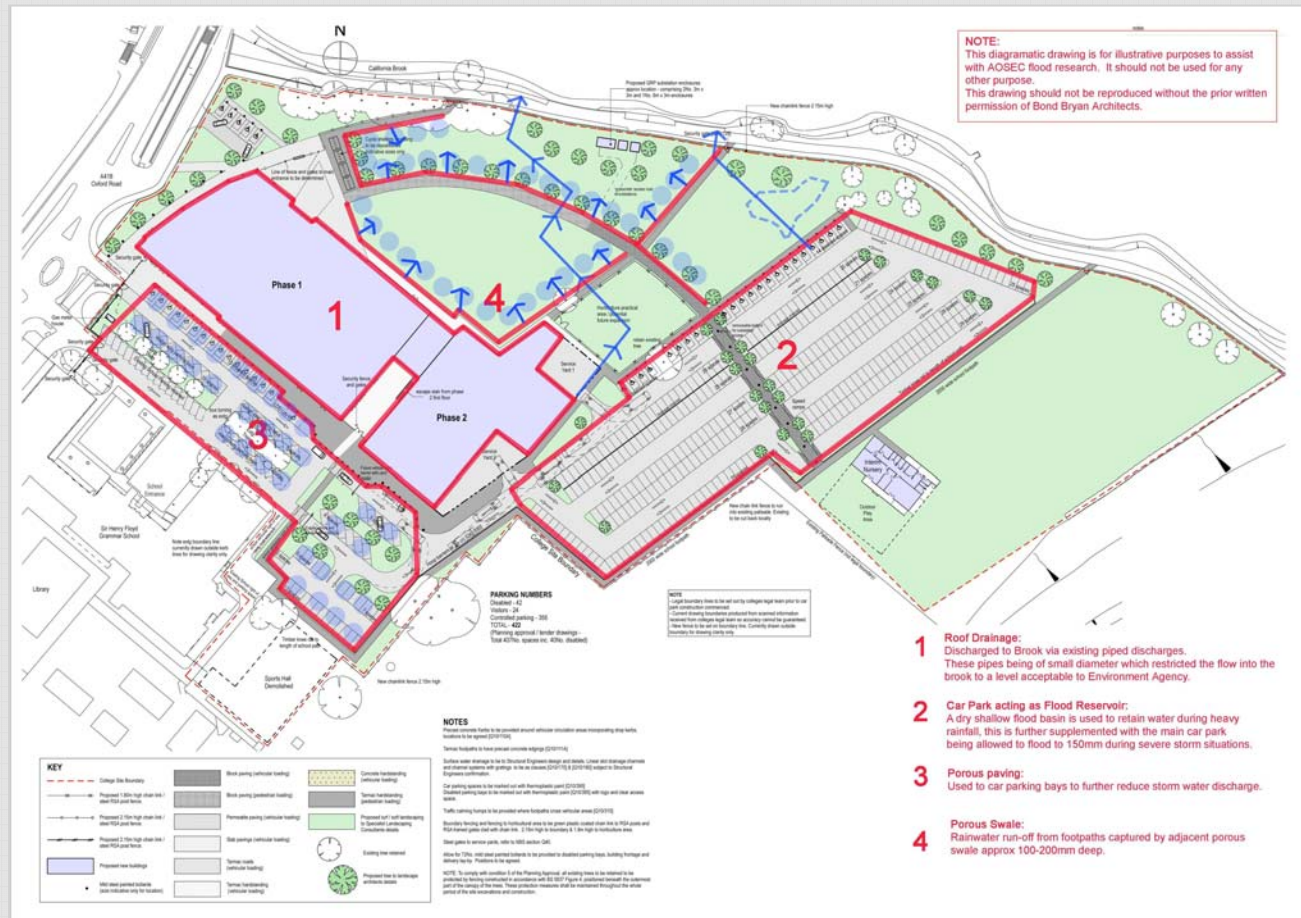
Plan showing sustainable Urban Drainage Strategy in Aylesbury College
